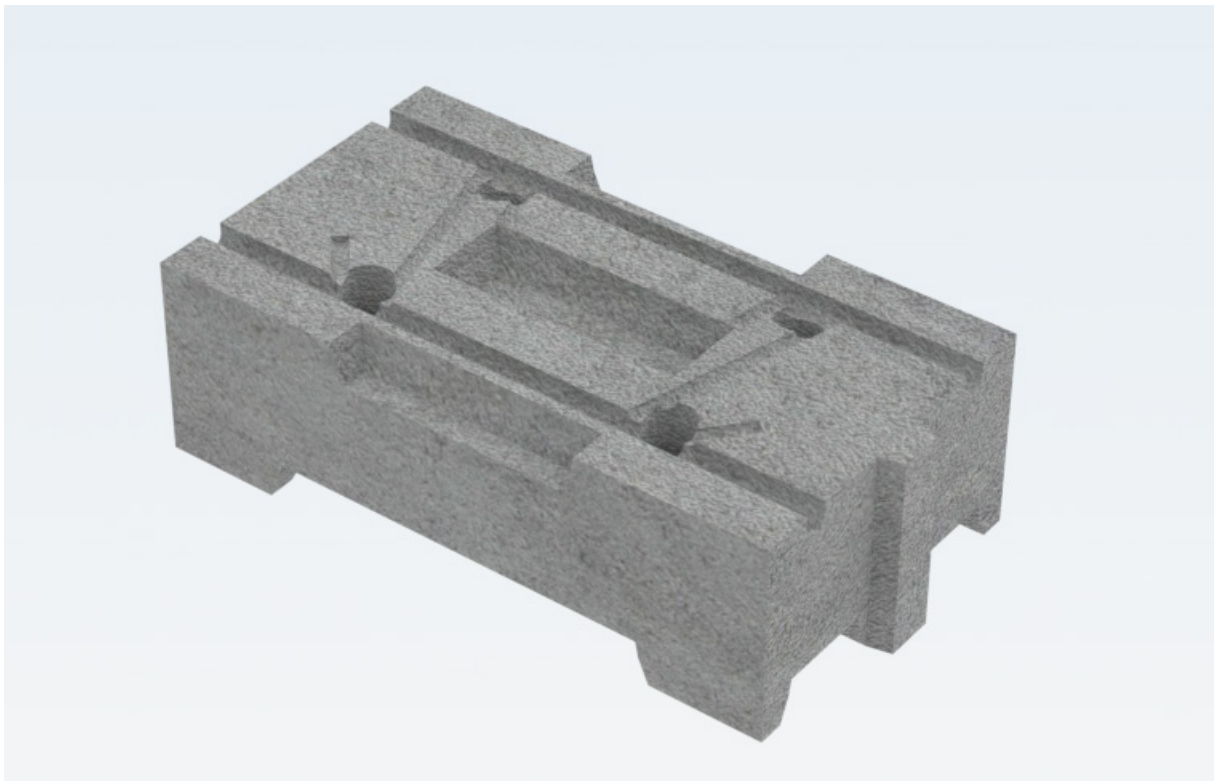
Step 17: After the whole rebar framework is finished, non-shrink injectable grout is used to be injected in the longitudinal rebar holes (while the stirrup grooves on the side need to be plugged), in order to solidify the connection between the ststeel and precast concrete elements.
